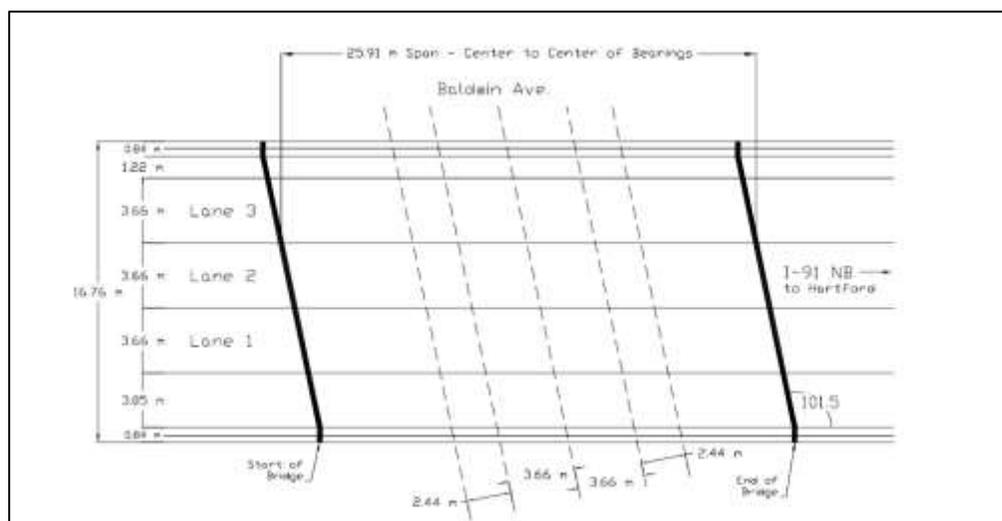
Meriden Bridge plan view (Wall *et al*, 2009)
